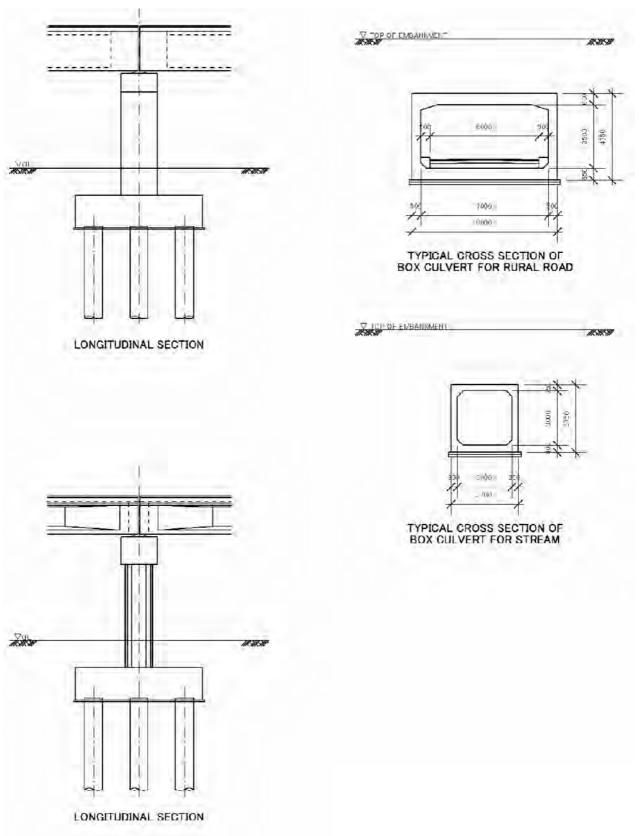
Structural Arrangement of the Red River Bridge for RR4 (1/3)
